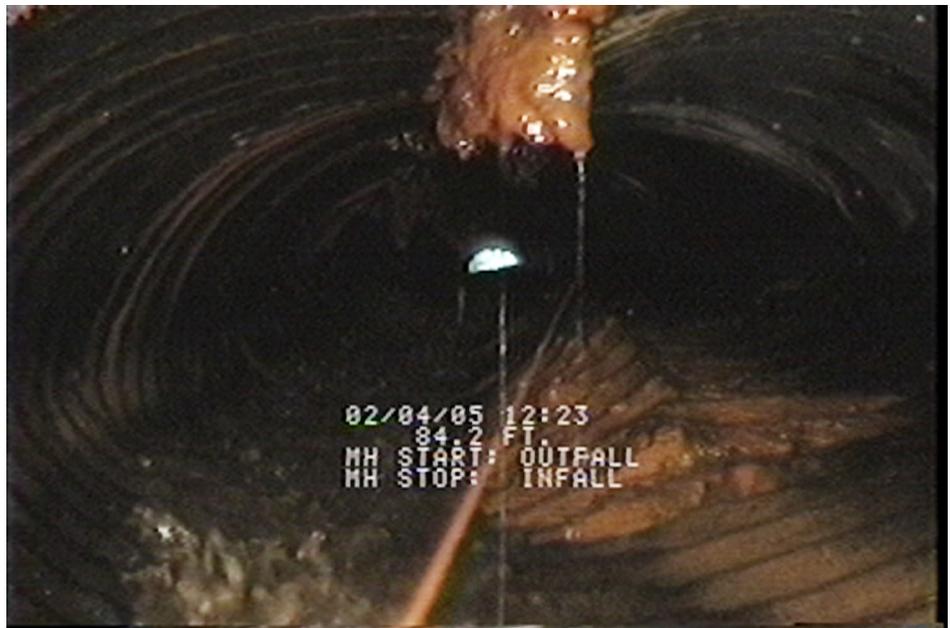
Inside the culvert looking upstream, 84 feet from the outfall, Road 1924 milepost 0.1. (The orange line is a sewer string used to pull the camera up through the culvert.)
